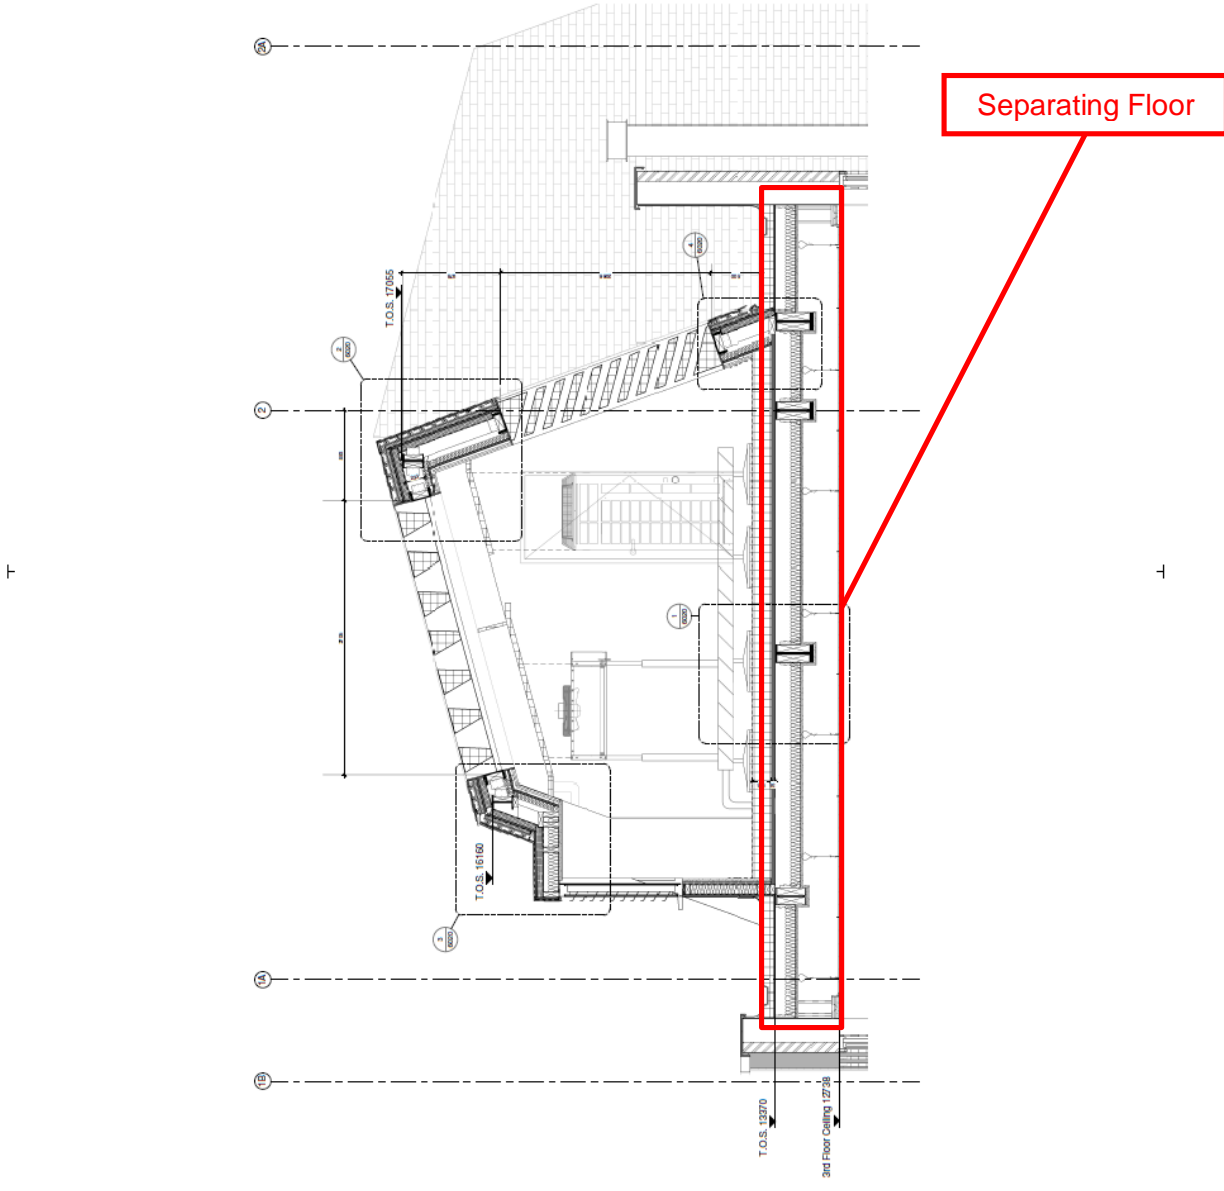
4<sup>TH</sup> FLOOR PLANT ROOM SECTION INDICATING SEPARATING FLOOR STRUCTURE (NTS)
